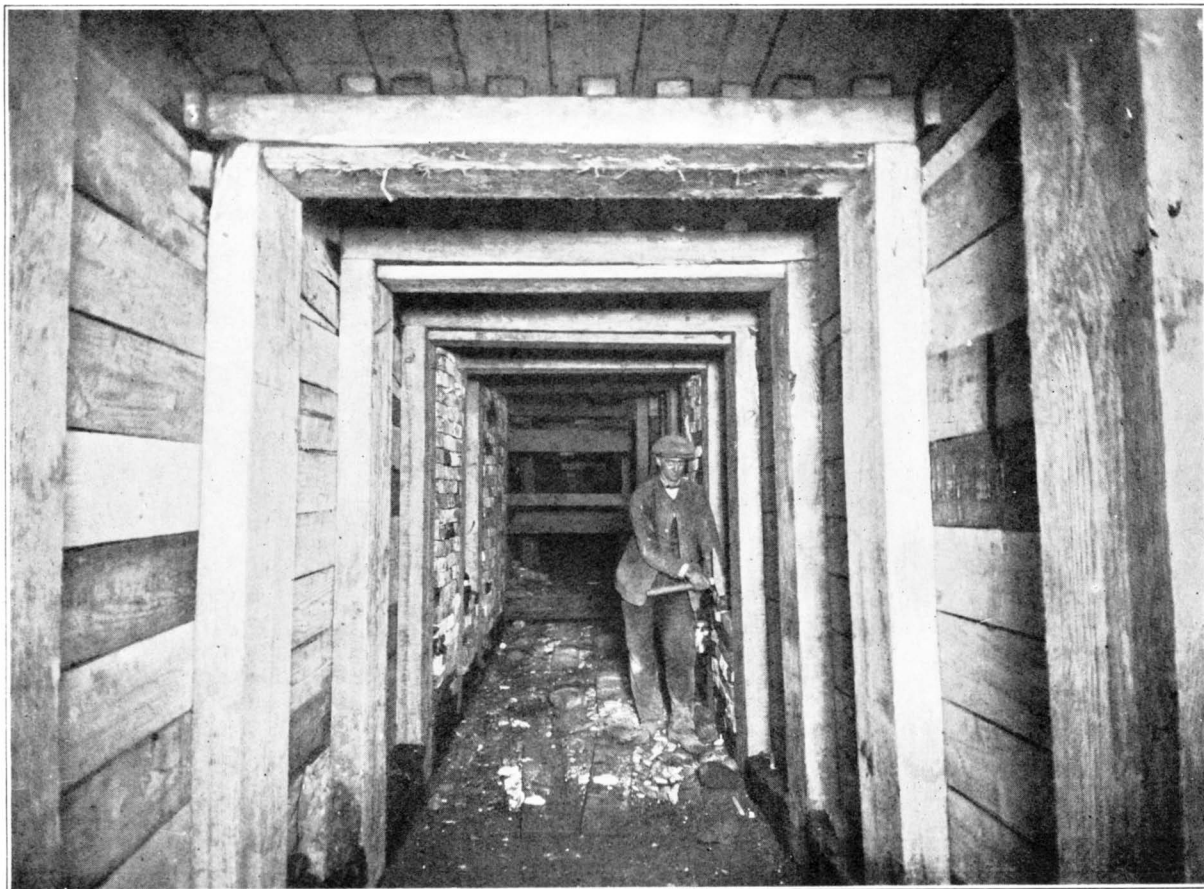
TUNNELING: PACKING OF SPACING BETWEEN SIDE TREES.
